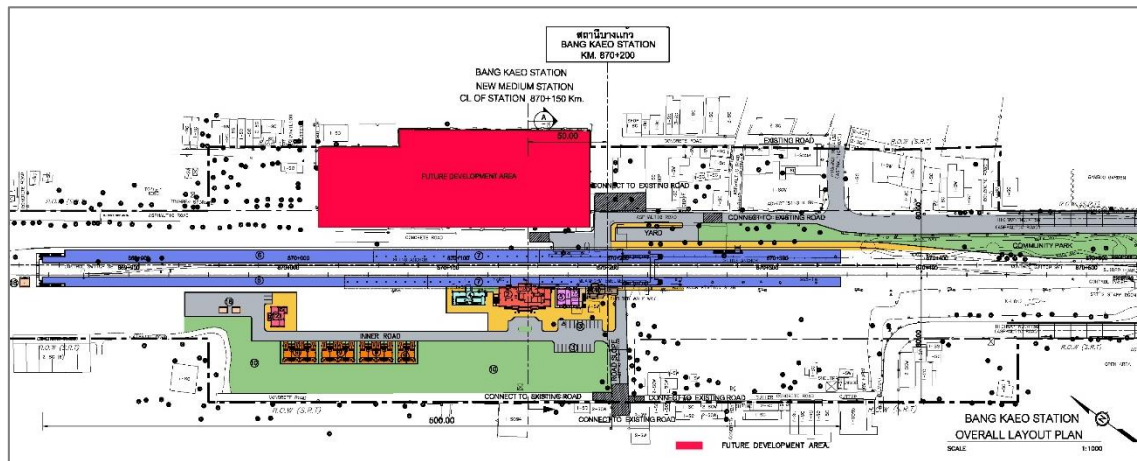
Bang Kaew station layout showing future development area
